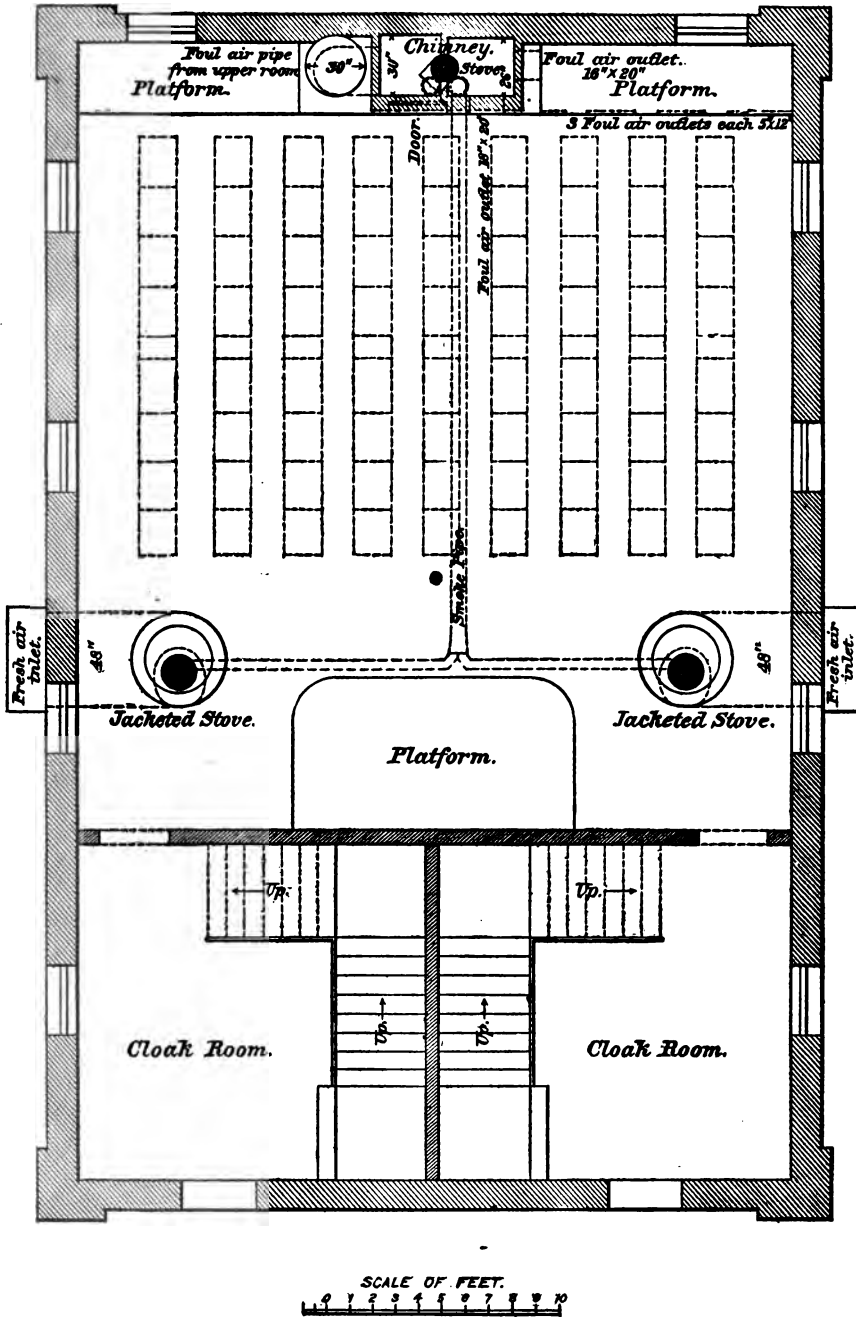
Red Rock Street Schoolhouse. (Lower room; front plan.)
